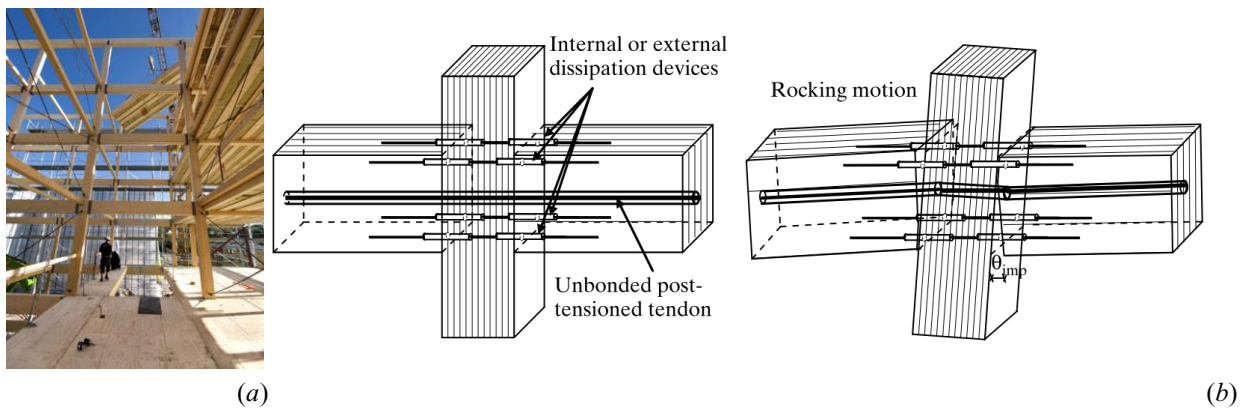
Heavy timber frame system: (a) example of building [38] and (b) detail of a post-tensioned joint [7] (image credits: (a) Swedish Wood [38], (b) Buchanan *et al.* [7]).
